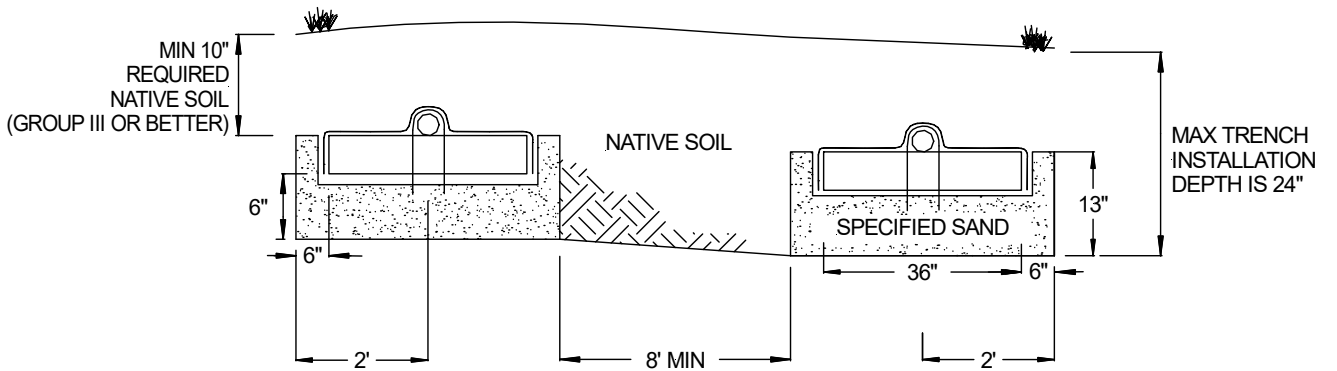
SECTION VIEW – B43 TRENCH SYSTEM – SLOPING SITE
